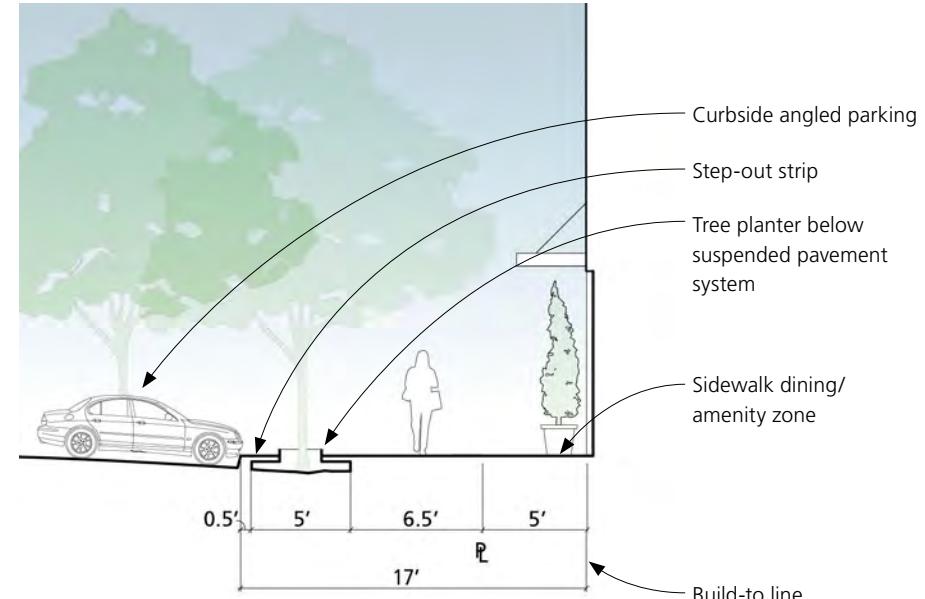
Westminster Boulevard and Gray Street Sidewalk at Angled Parking
